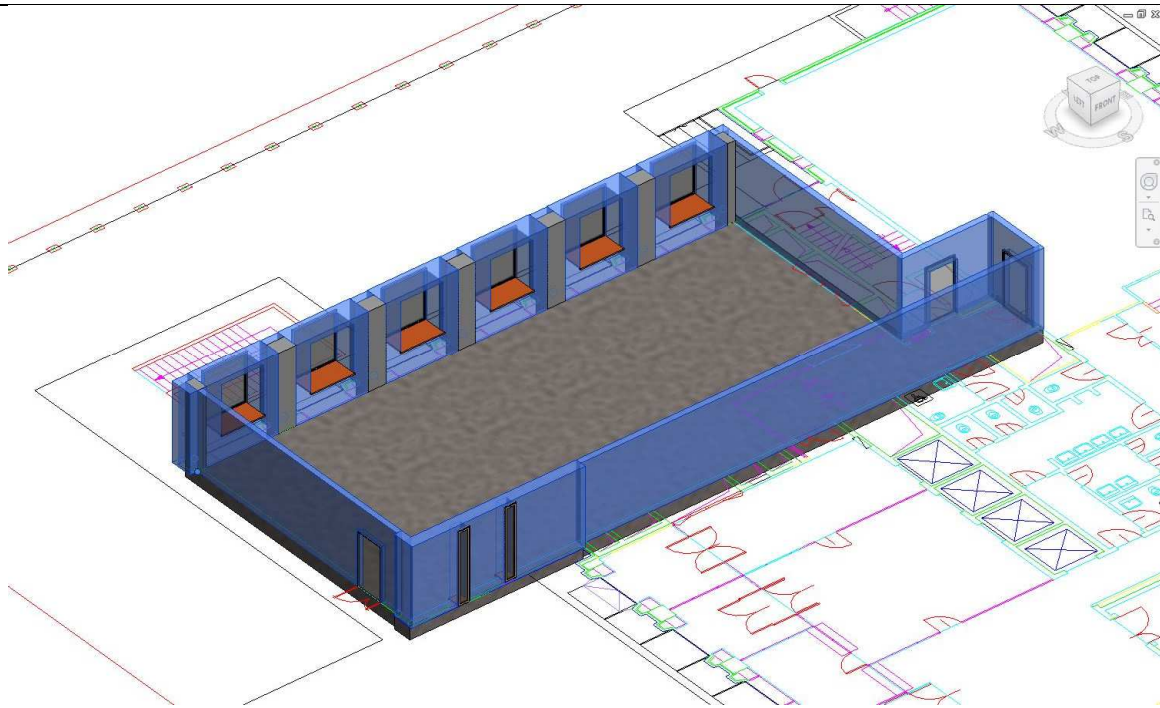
BIM Building Room Data Management the external continuous wall object generation and the internal ones that subdivide the building room distribution
